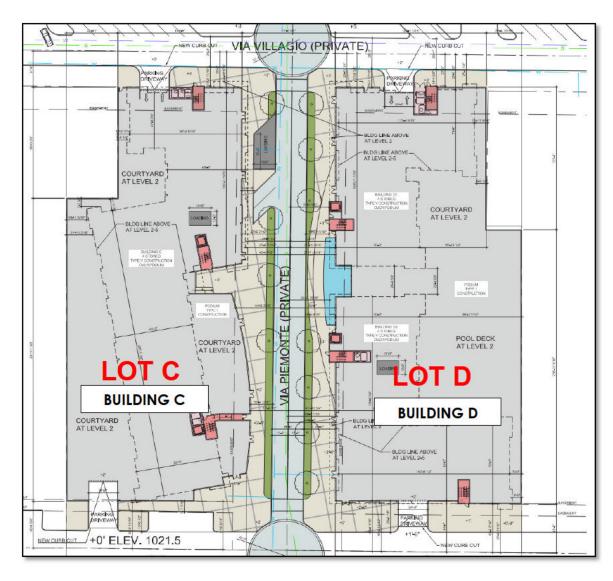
EXHIBIT C—PROPOSED SITE PLAN CONTINUED
